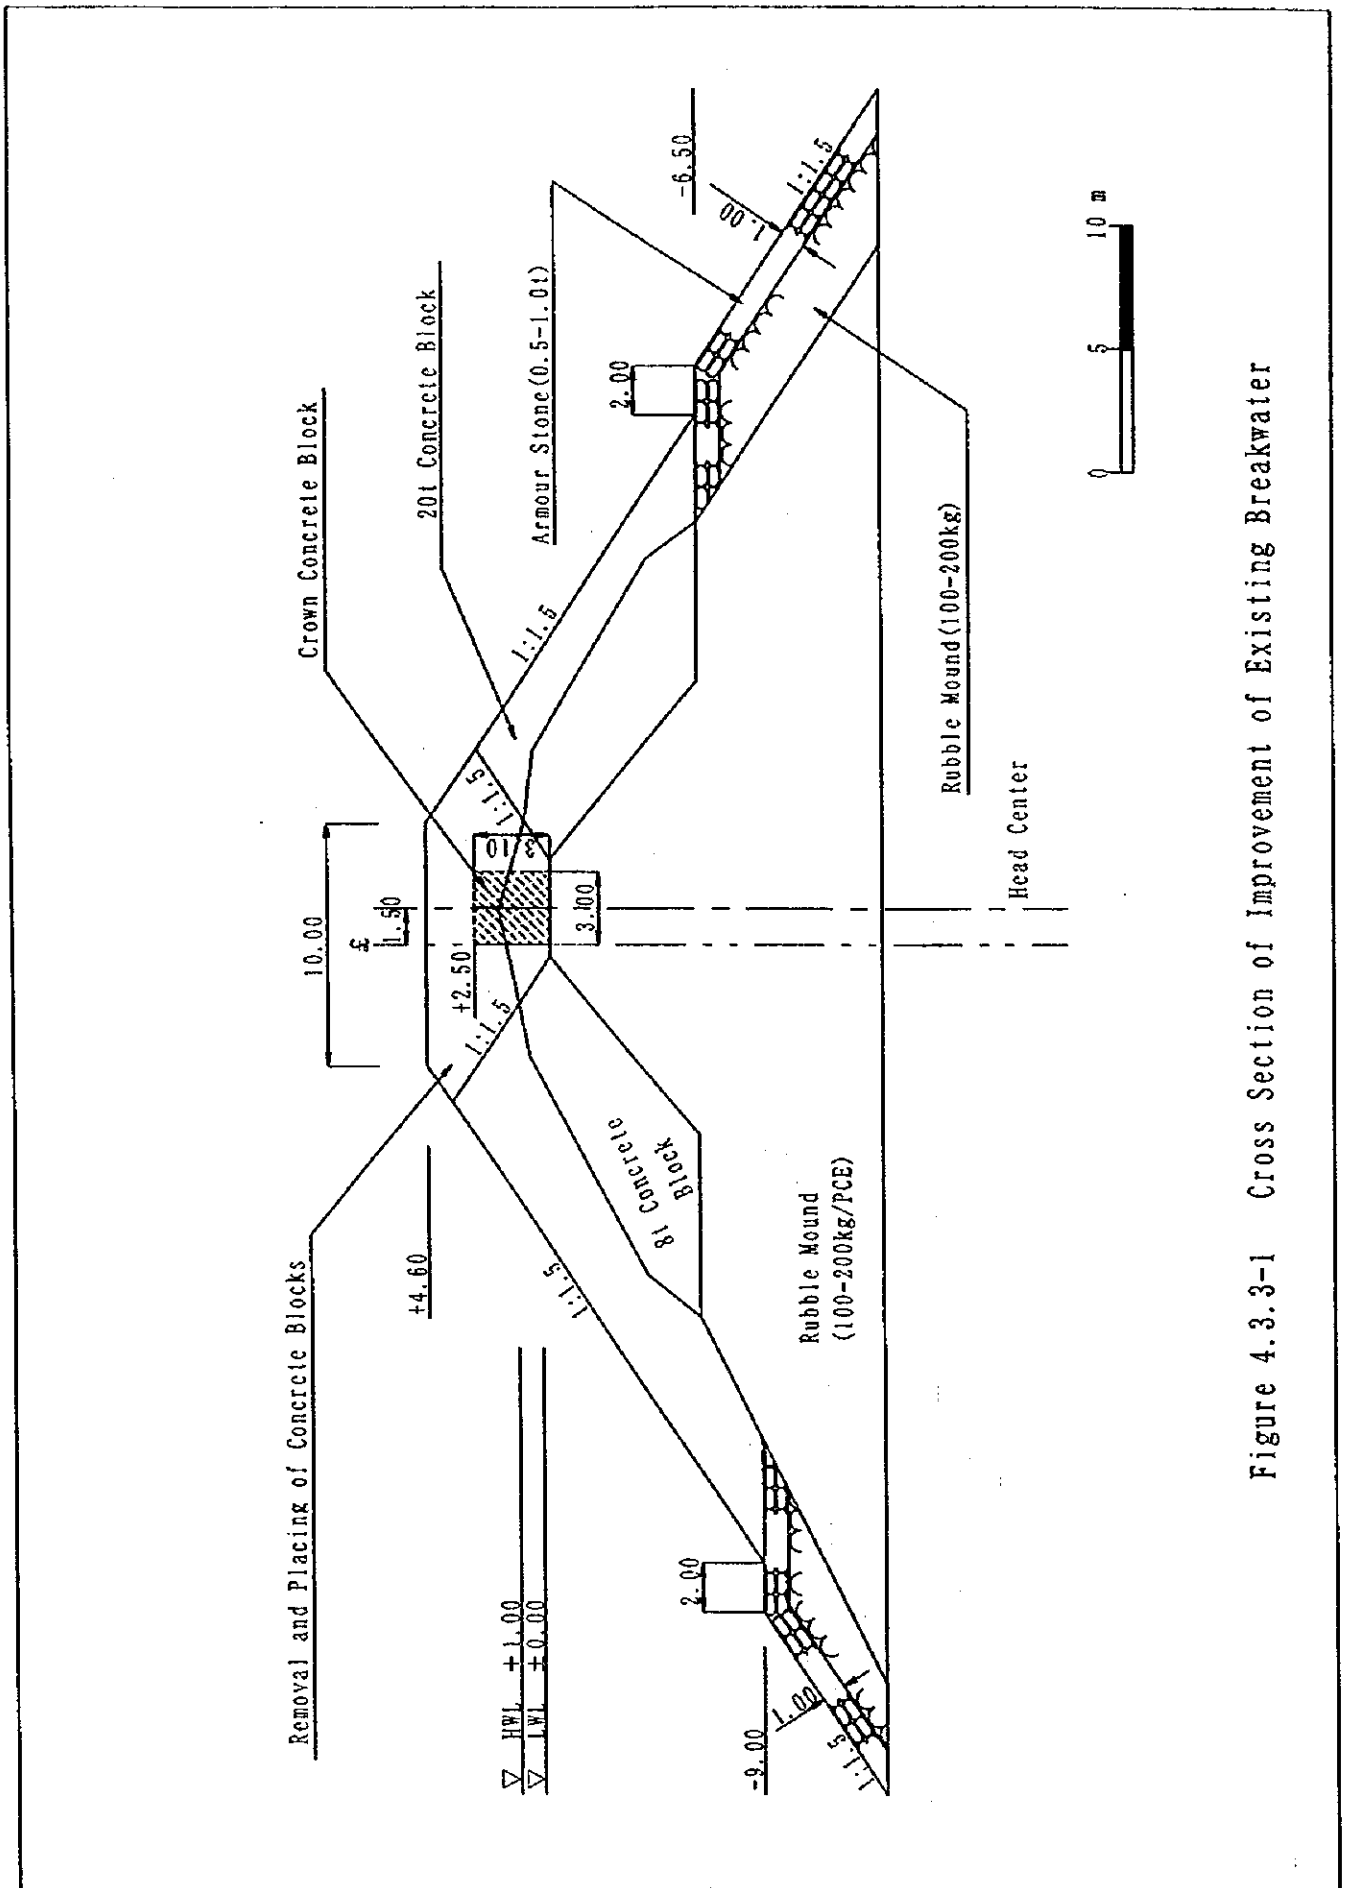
Cross Section of Improvement of Existing Breakwater
